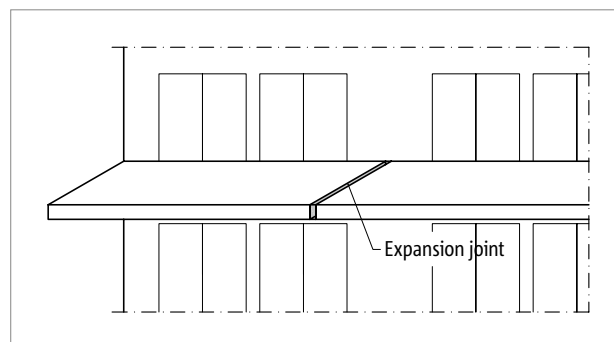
Structural component joint - expansion joint divides individual structural components only
